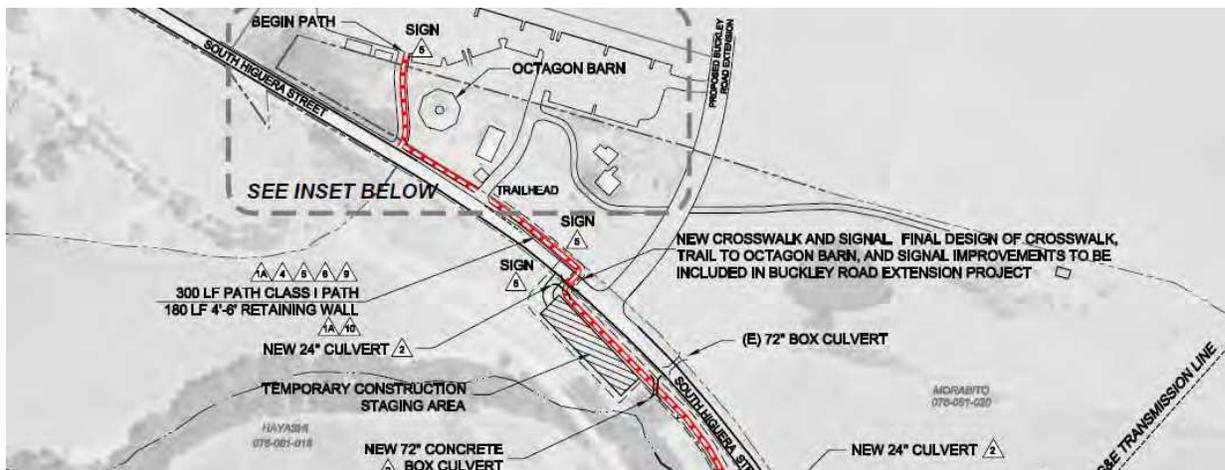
At-Grade S. Higuera Street Crossing Option at Future Buckley Road Extension Signalized Intersection
